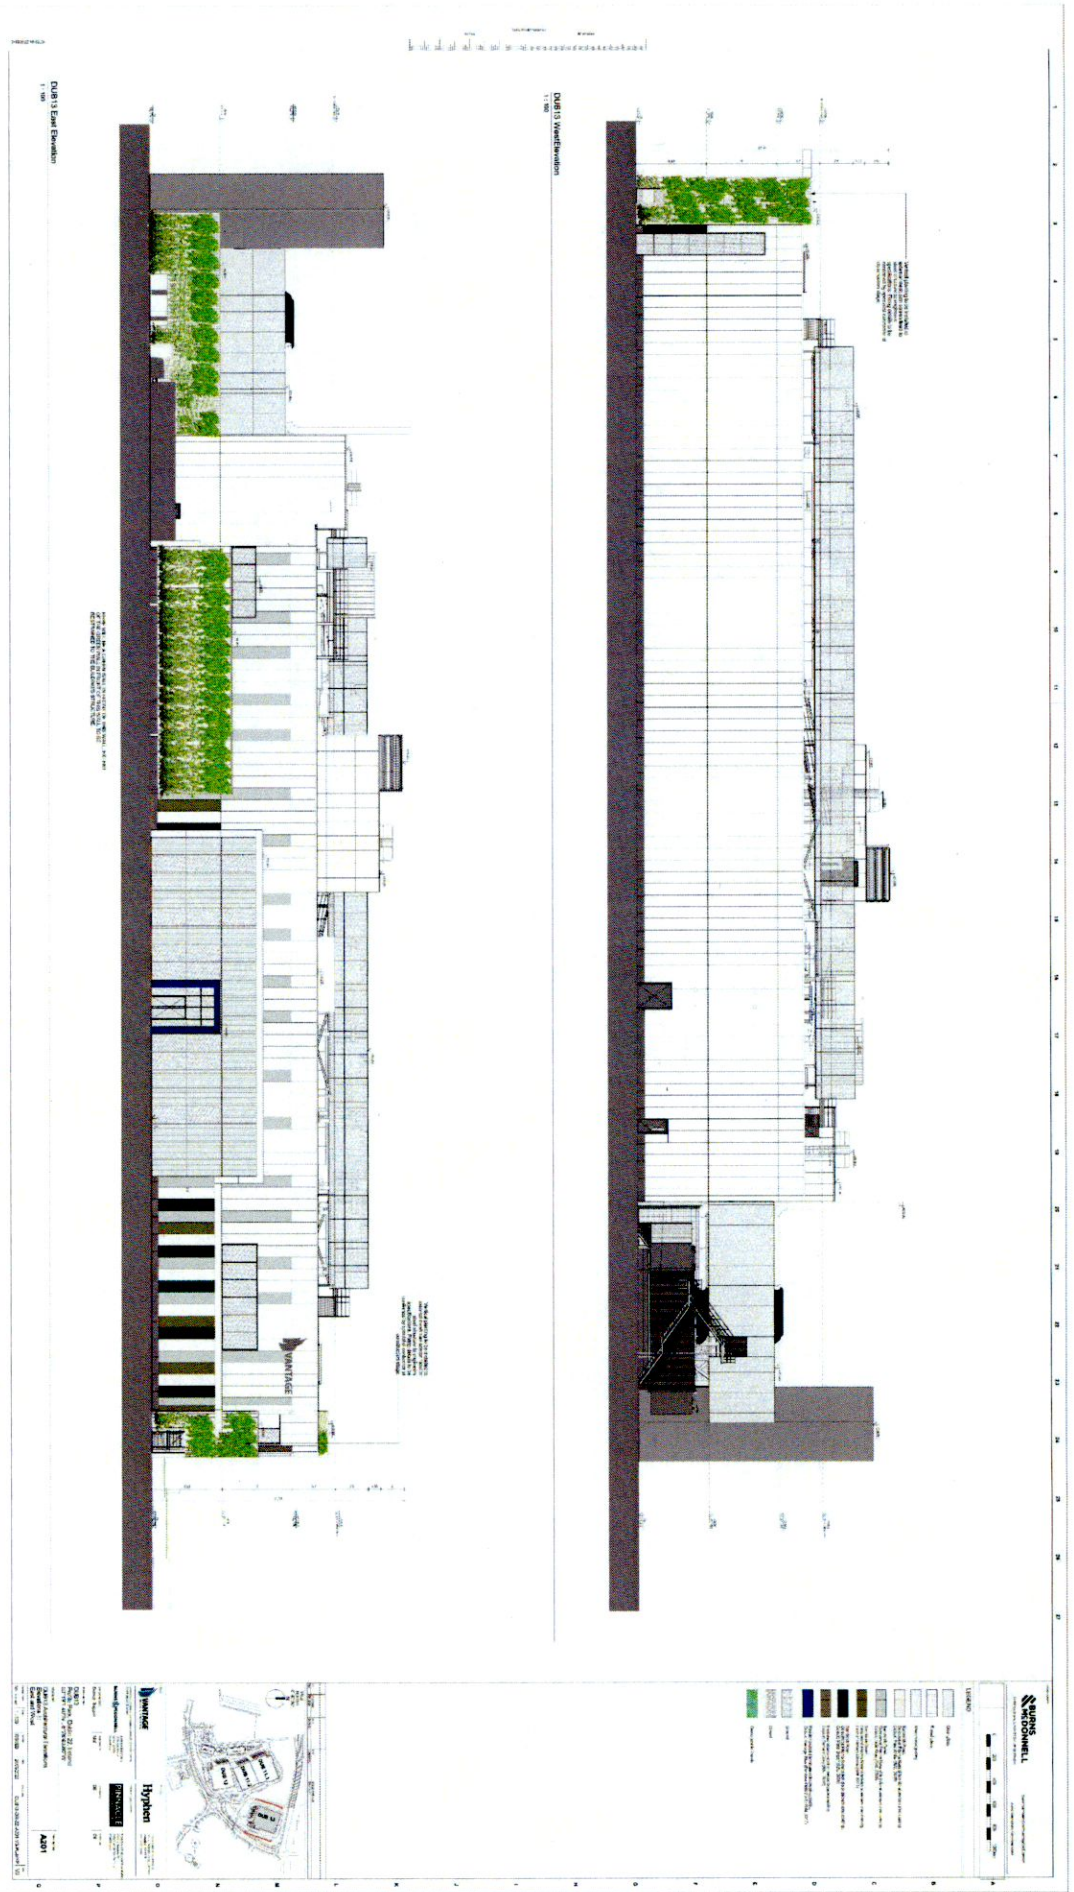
DUB-13 East and West Elevations (Source Burns & McDonnell)
